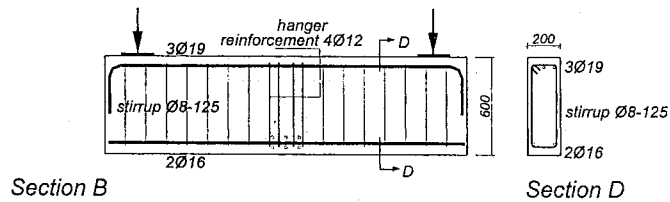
Elevation and section of beam transferring load (Node A)
